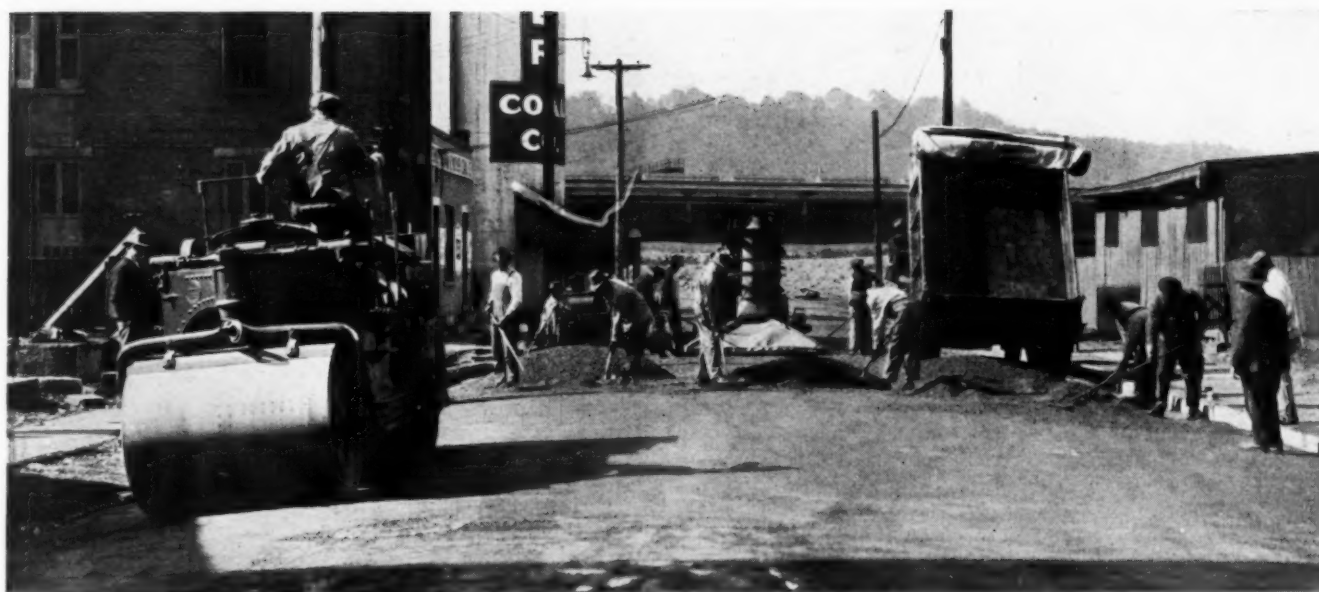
Surfacing an Old Asphalt Patched Boulder Street with Sheet Asphalt
